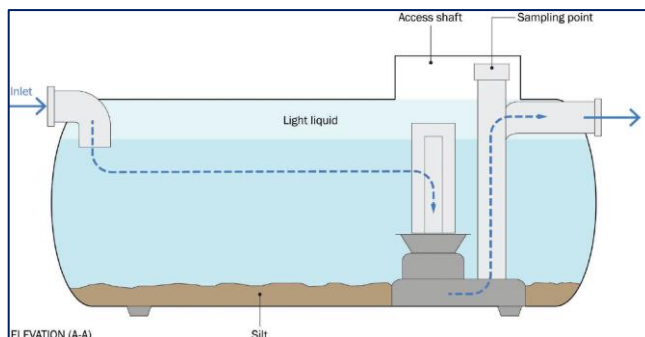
Typical Section Detail of Fuel Separator (CIRIA C753)
